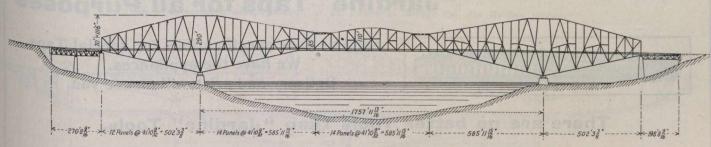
Official design V, by Board of Engineers, for new bridge.
